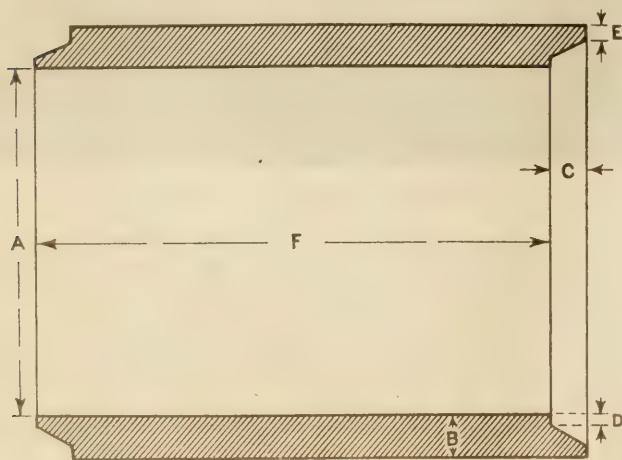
Longitudinal section of concrete pipe with beveled-lip joint.
